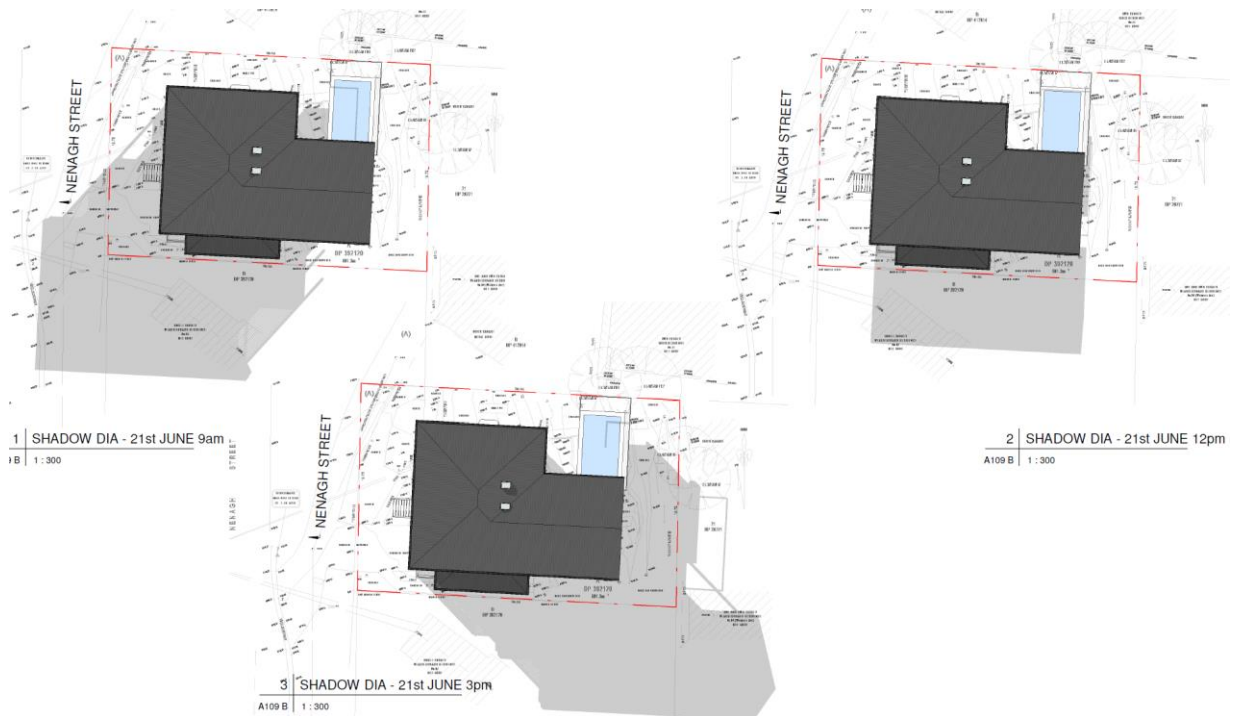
the proposed shading impact to the southern adjoining development on 21 June
